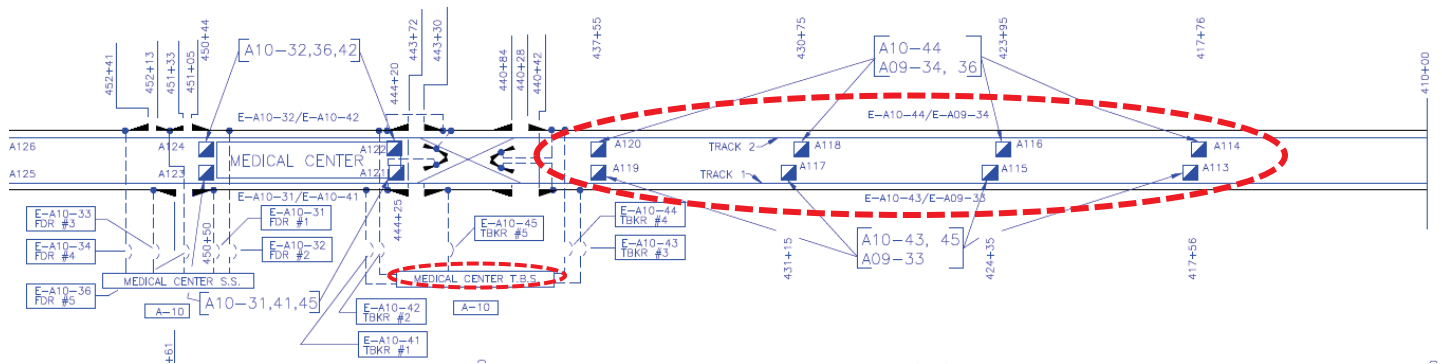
CONTACT RAIL SCHEMATIC SHOWING WAYSIDE ETS BOXES POTENTIALLY AFFECTED (ONLY BOXES IN TUNNEL AND NOT ON PLATFORMS)
